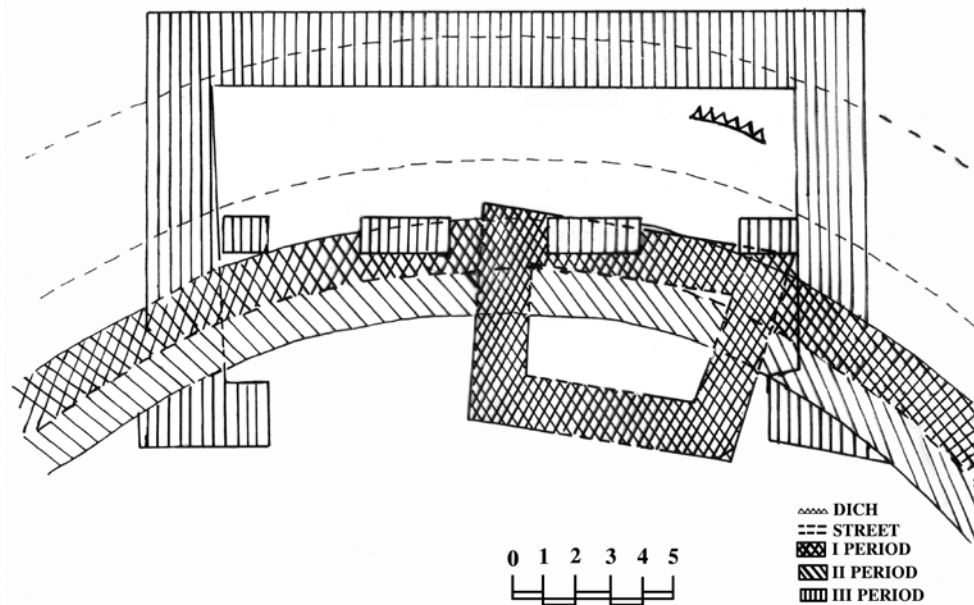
Plan of the southwest corner of the fortress with an internal trapeze shaped tower, external rectangular tower with four pylons, street and fosse.
